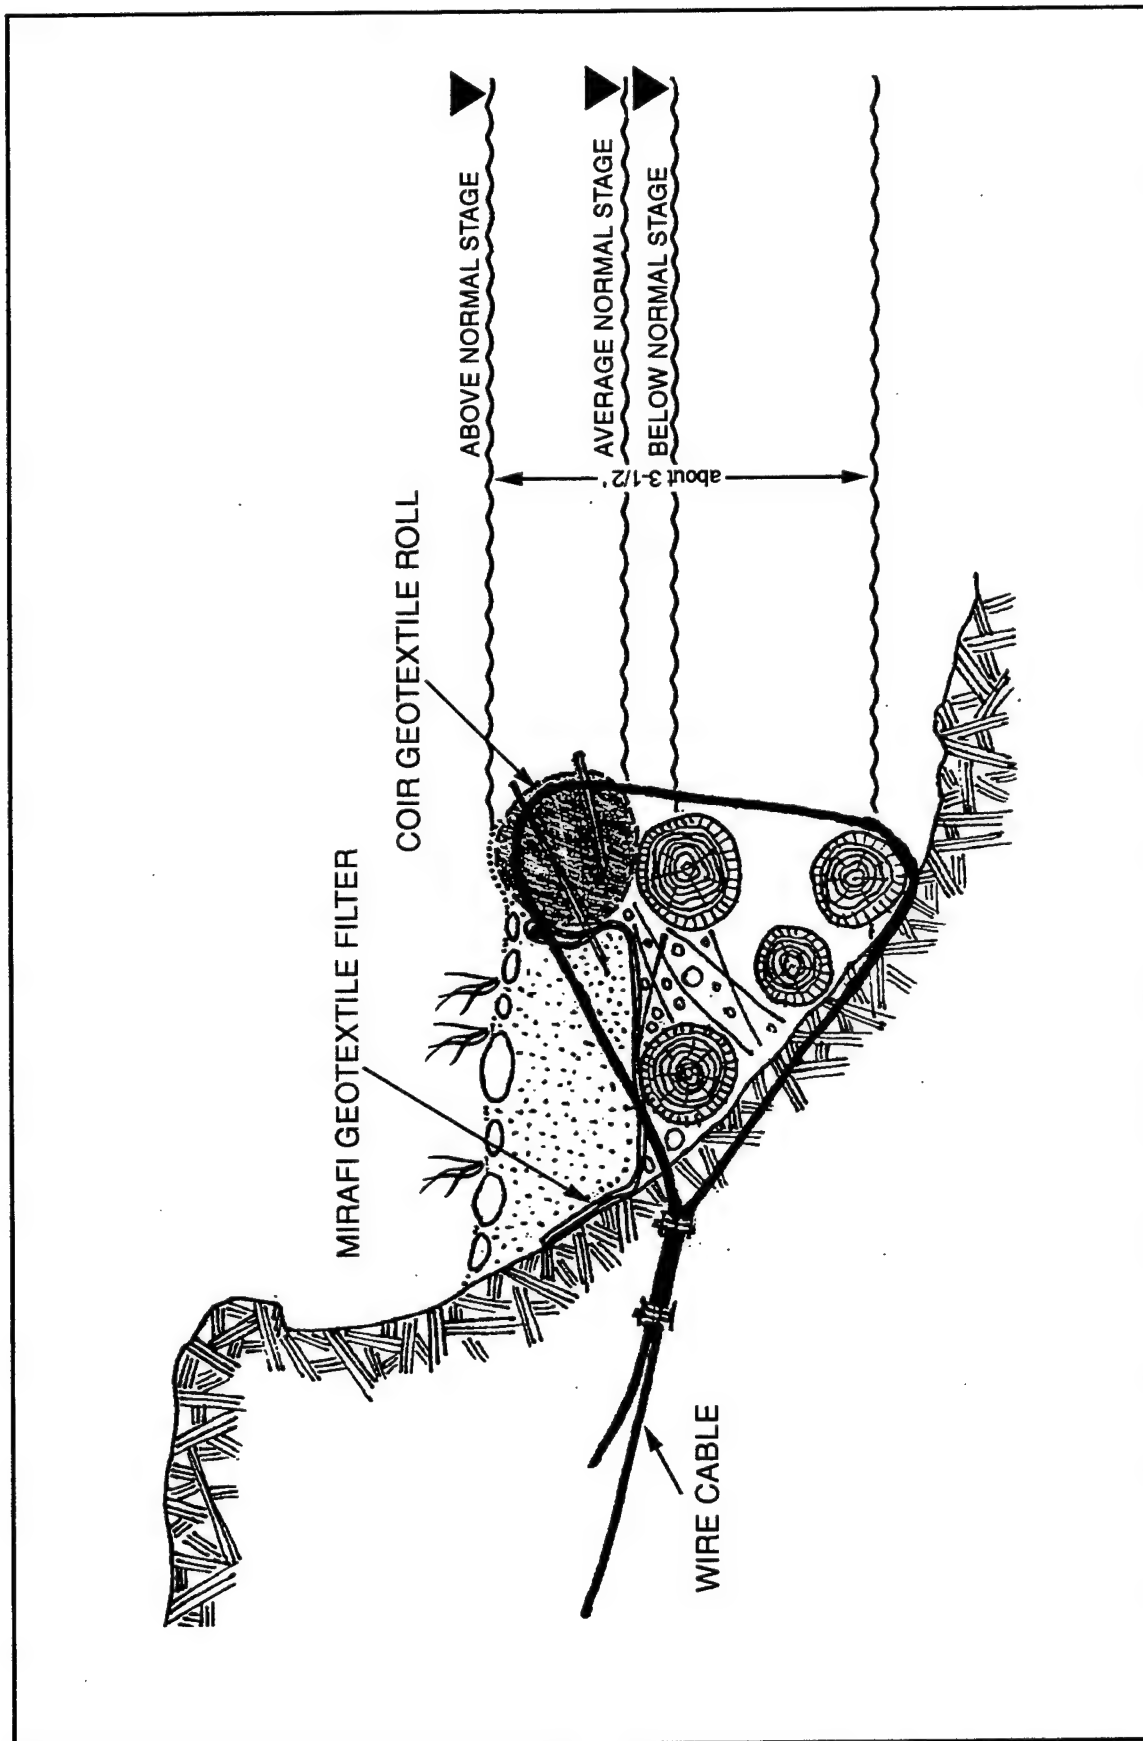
Schematic of log revetment with coir geotextile roll and plantings on top of backfill soil over a geotextile filter (Designed by Alan Czenkusch, Colorado Division of Wildlife)
